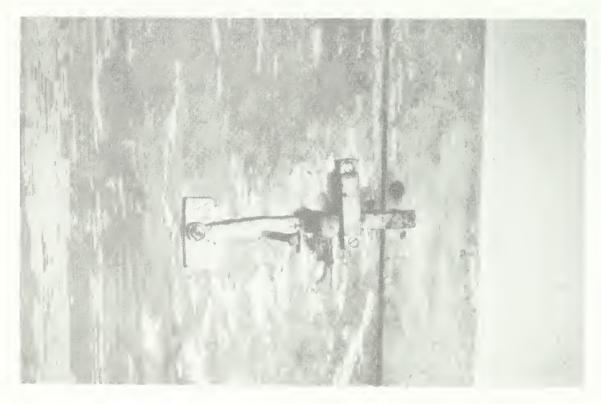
East servants' room (Room 209), west wall, detail of doorway D208 hardware.
